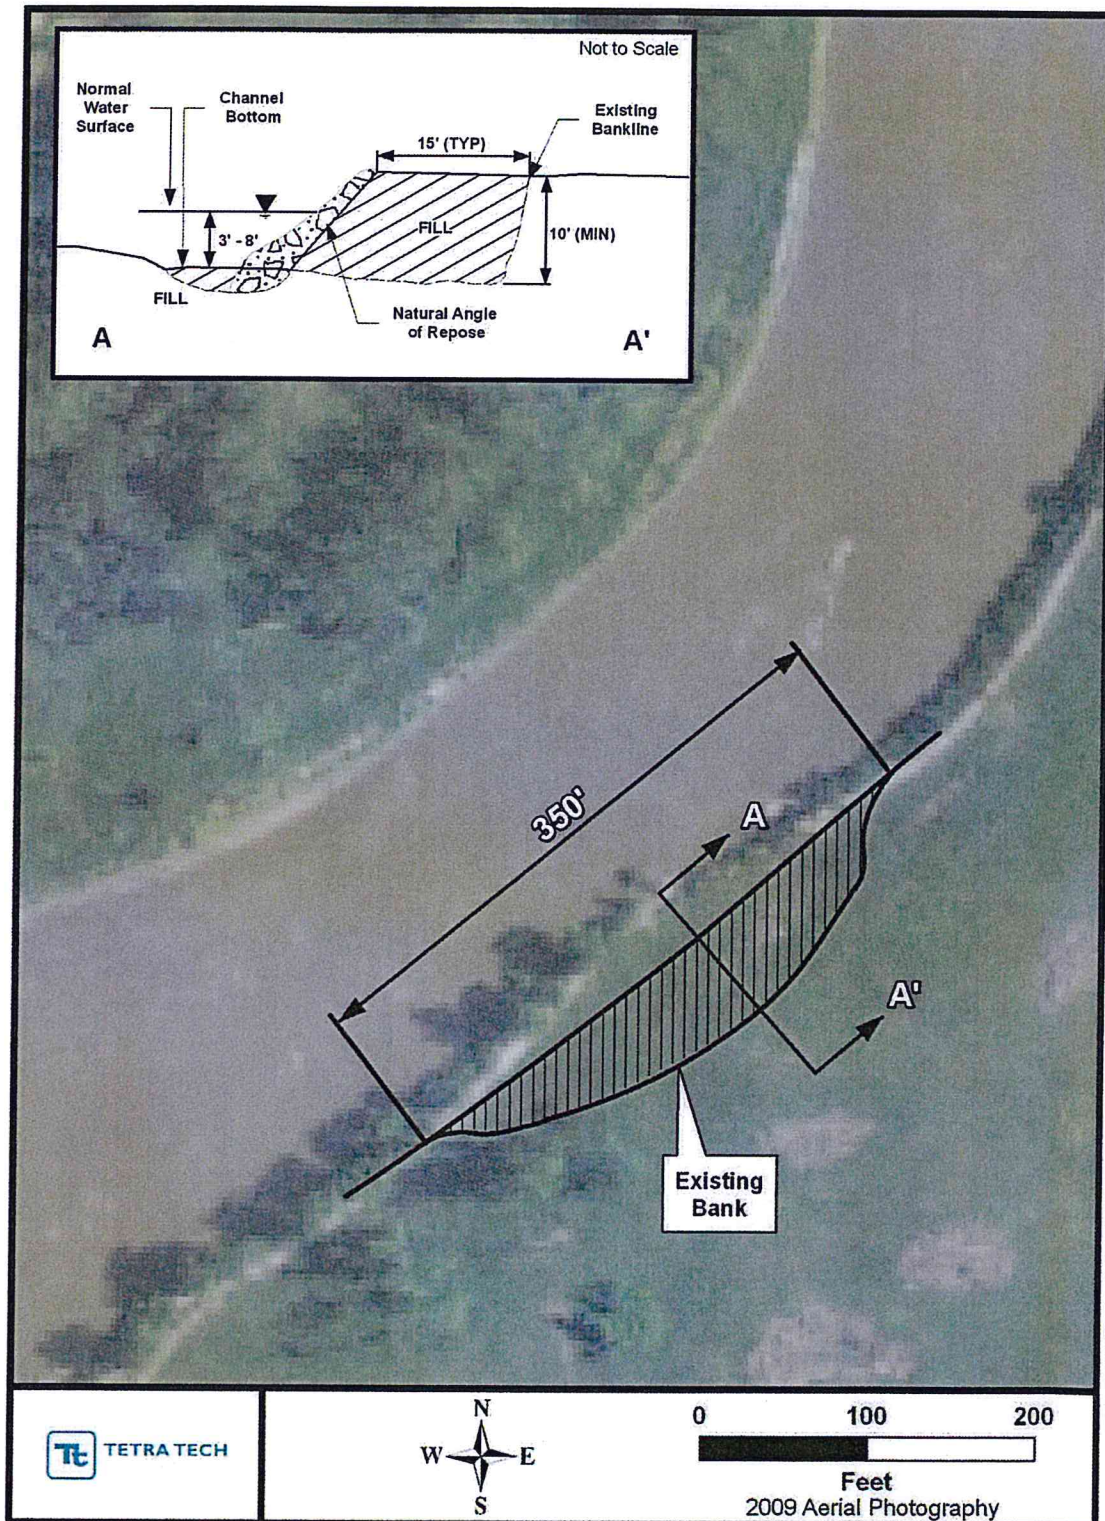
Recommended re-alignment of bankline at Field Site 8 and typical cross section of the rock riprap that should be placed along the realigned bank.
